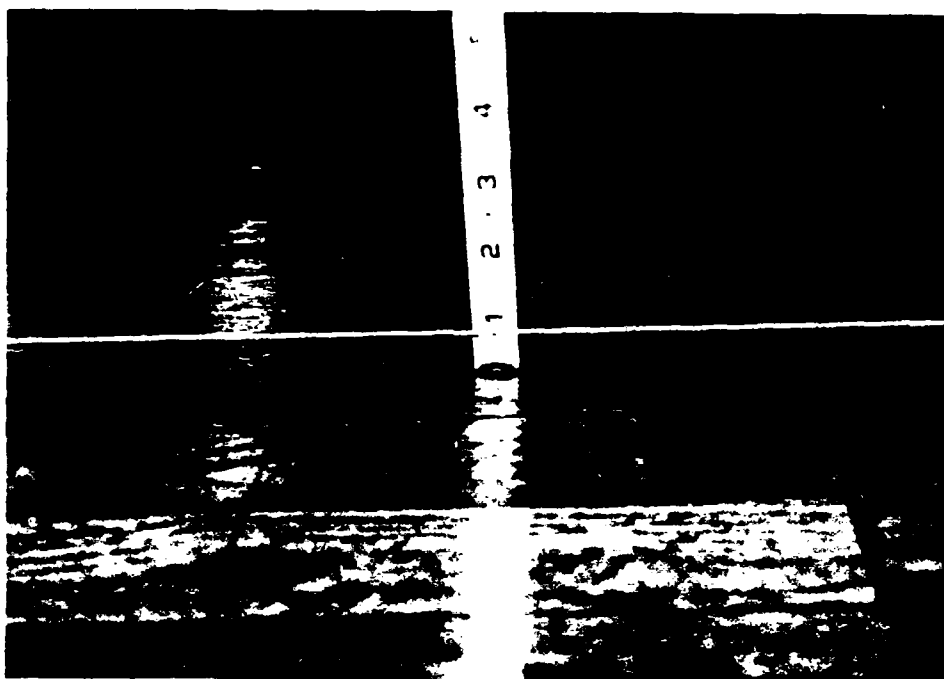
Deflection of floor in Room 210 between women's restroom walls below.
